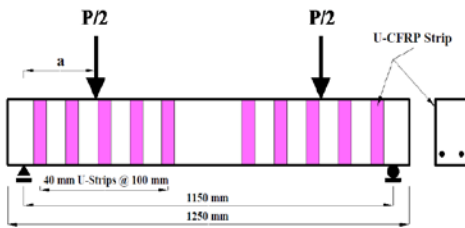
Shear Strengthening without End Anchoring B7 and B9<sup>(21)</sup>
